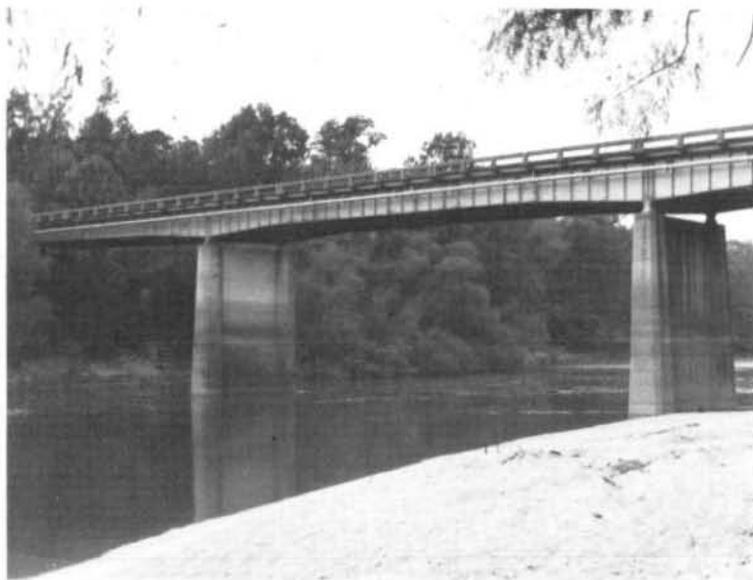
U. S. 378 HIGHWAY BRIDGE (R.M. 69.4)
